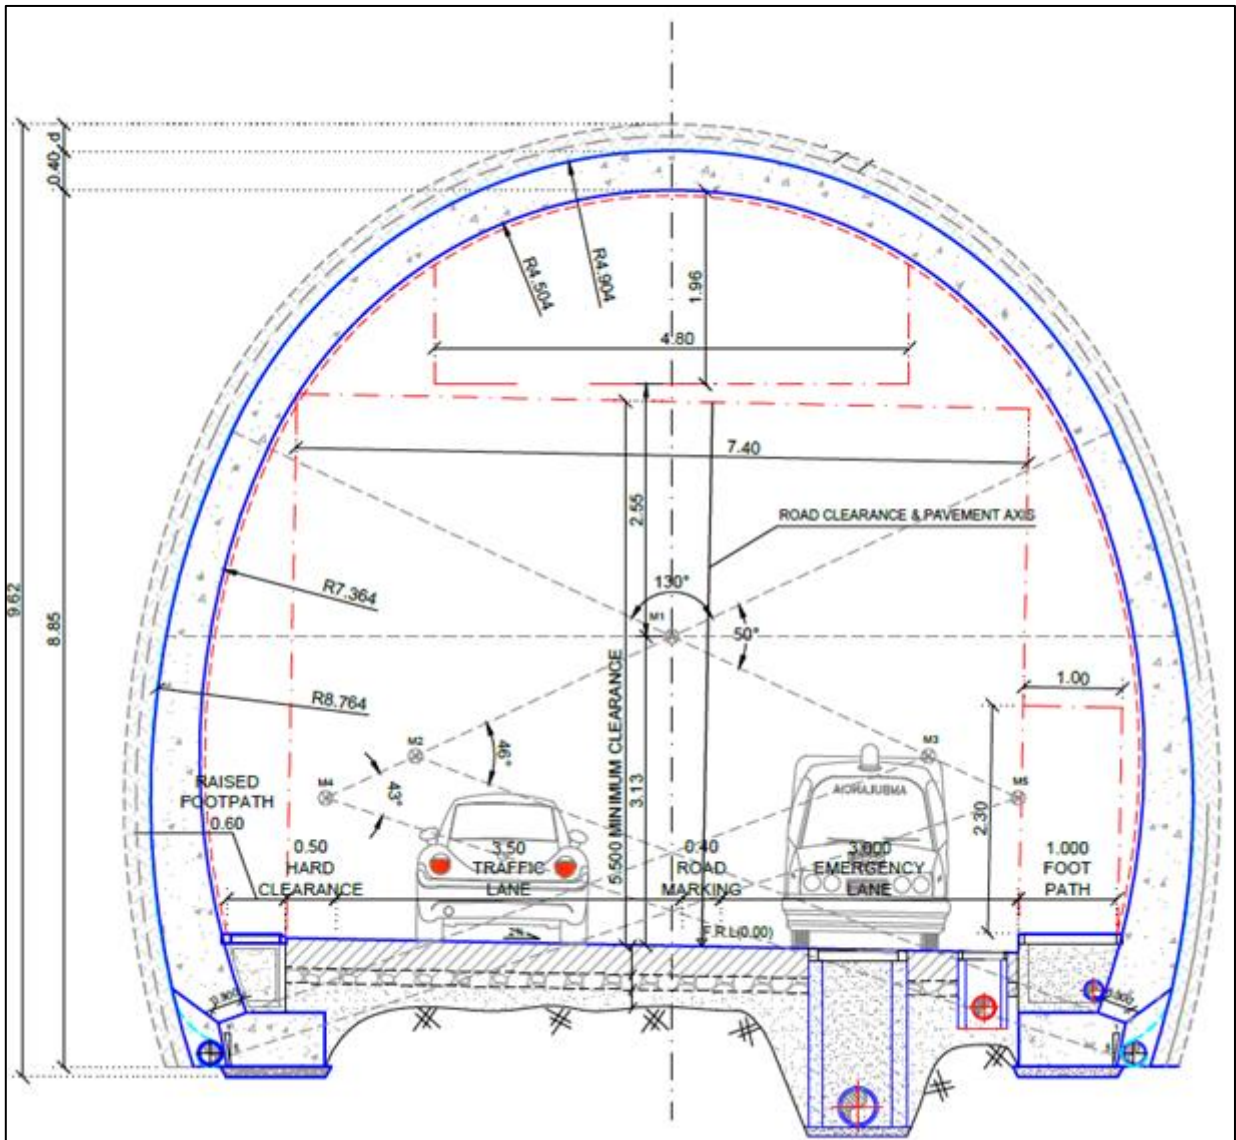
Typical Section of Tunnel (Twin Tubes) without Invert
